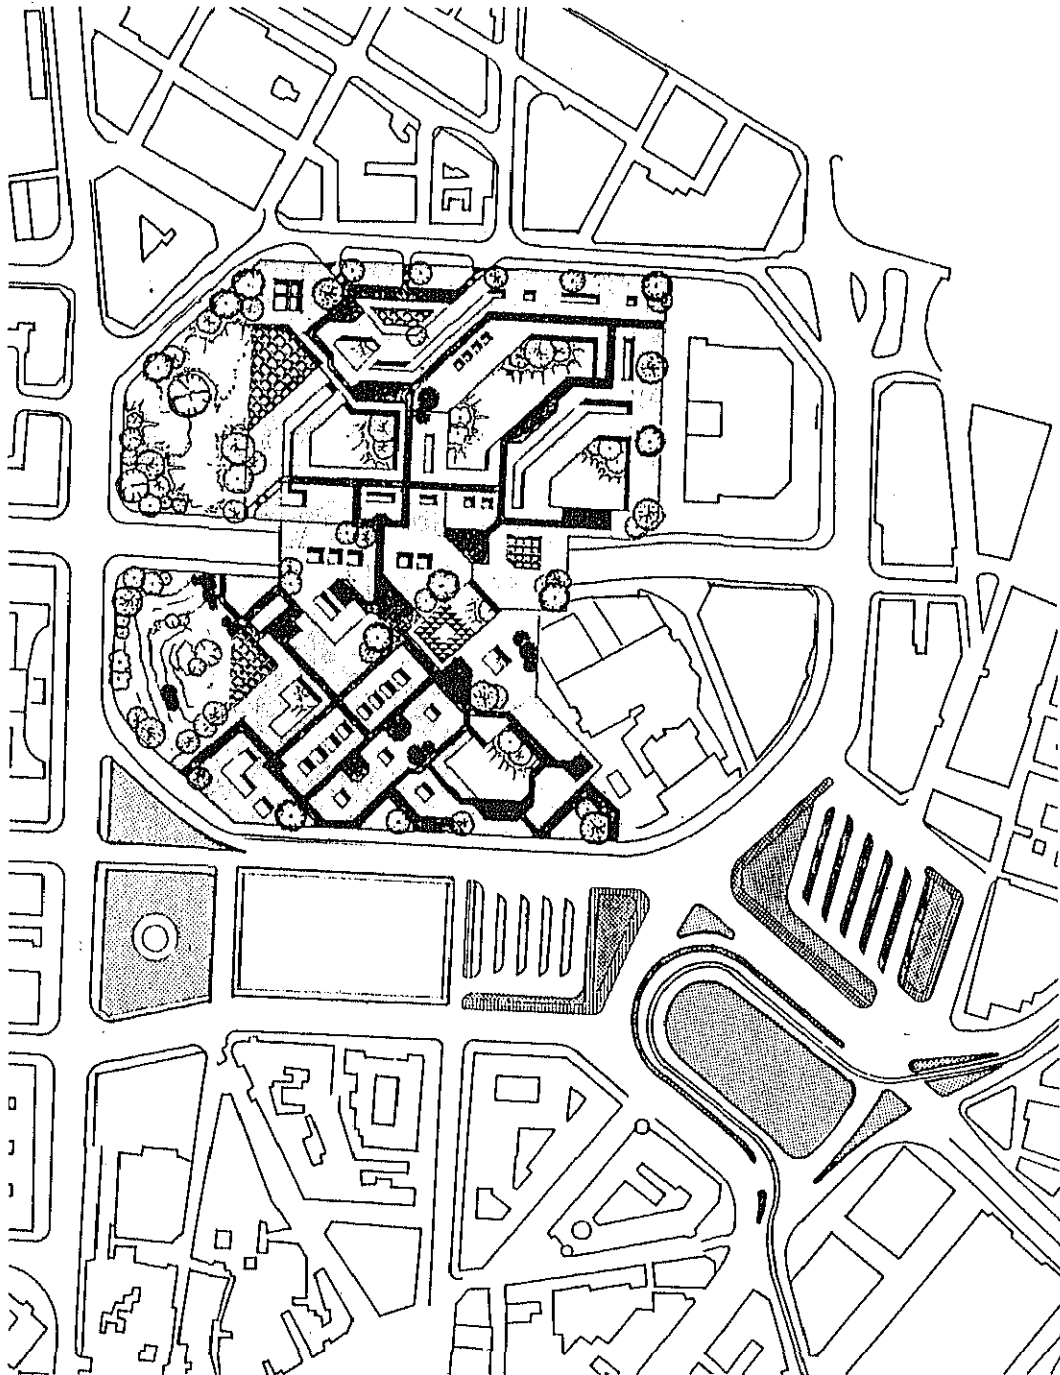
Development Image of Azbakiah Park Commercial Area Plan
